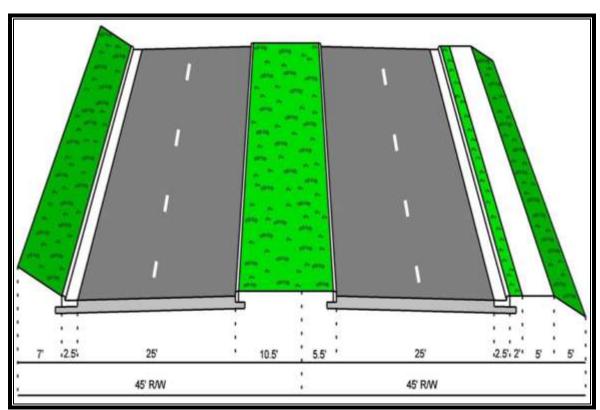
4-Lane, Divided (Raised Median), Curb & Gutter, Sidewalk One Side
